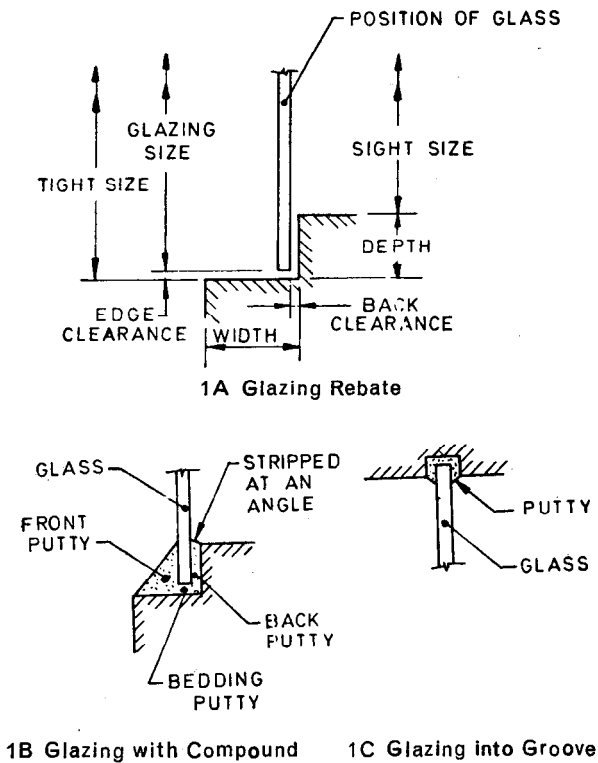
TYPICAL ILLUSTRATIONS SHOWING GLAZING DETAILS
